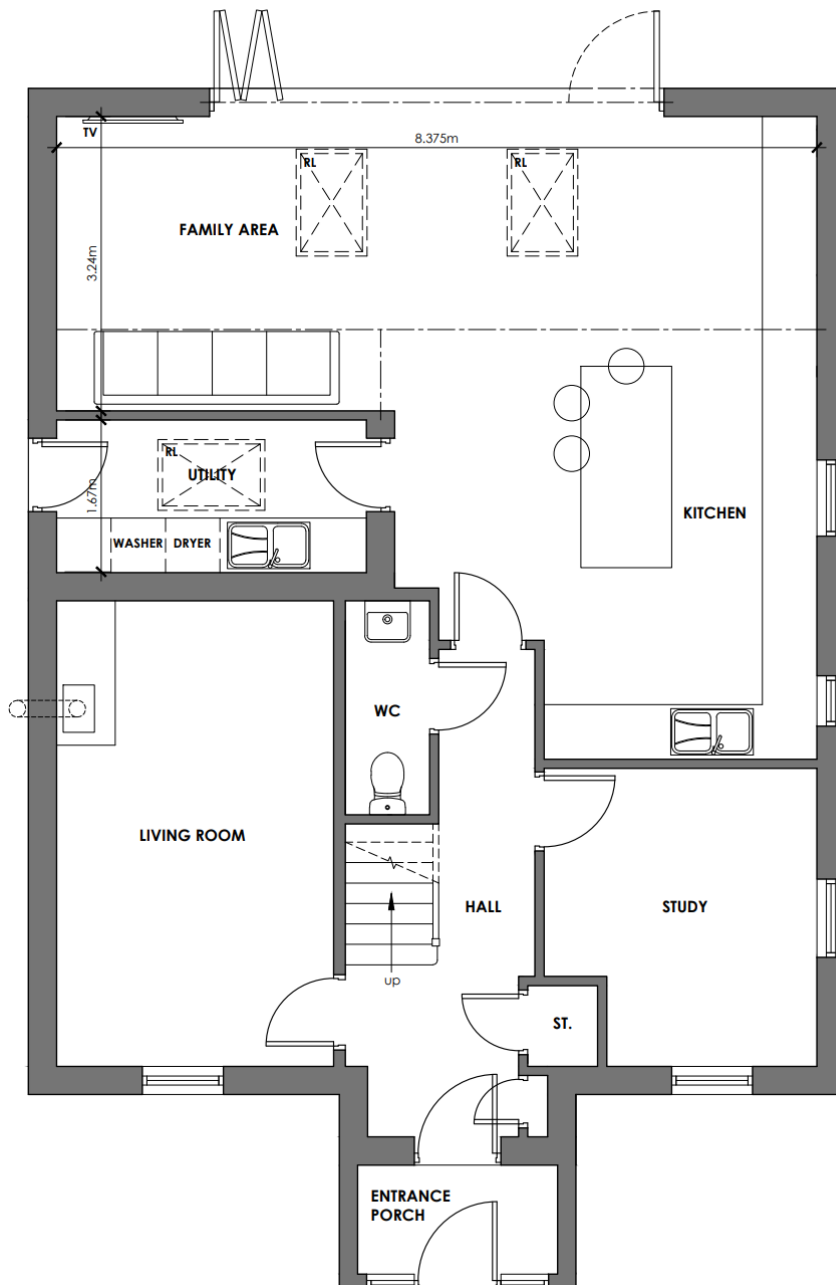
PROPOSED GROUND FLOOR PLAN
